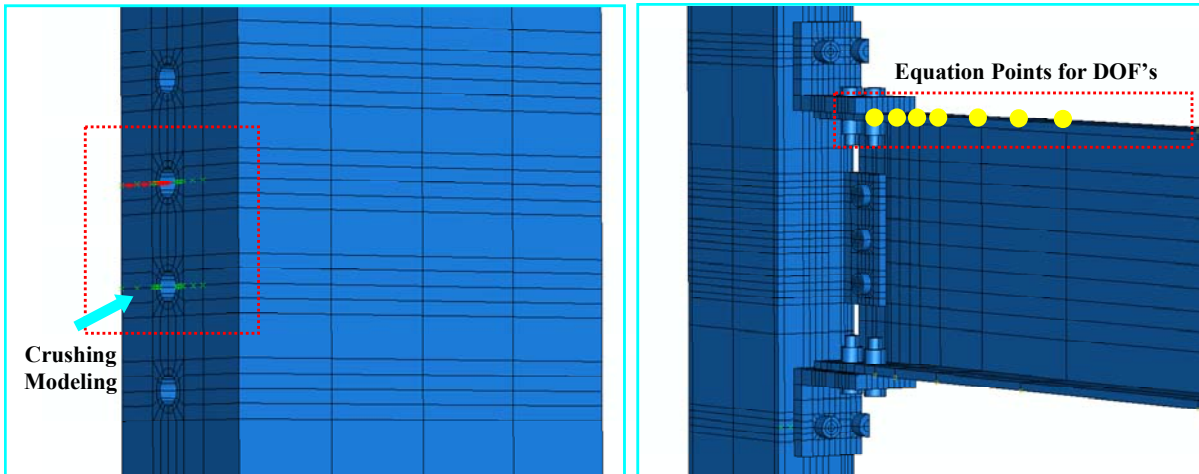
Modeling method for concrete cracks (Left)
